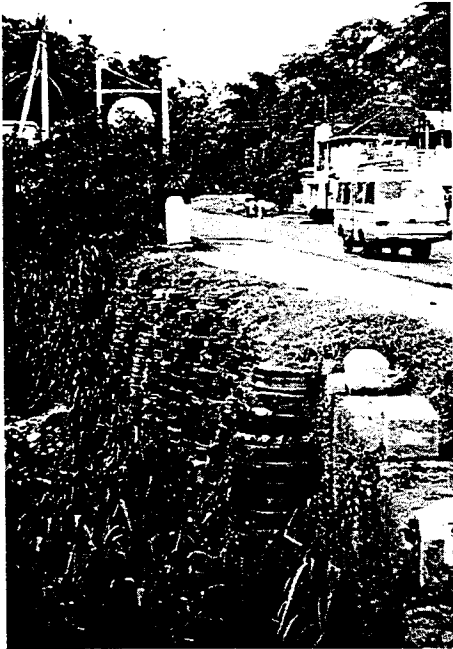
Completed Anchored Tyre Structure at Ranwala
